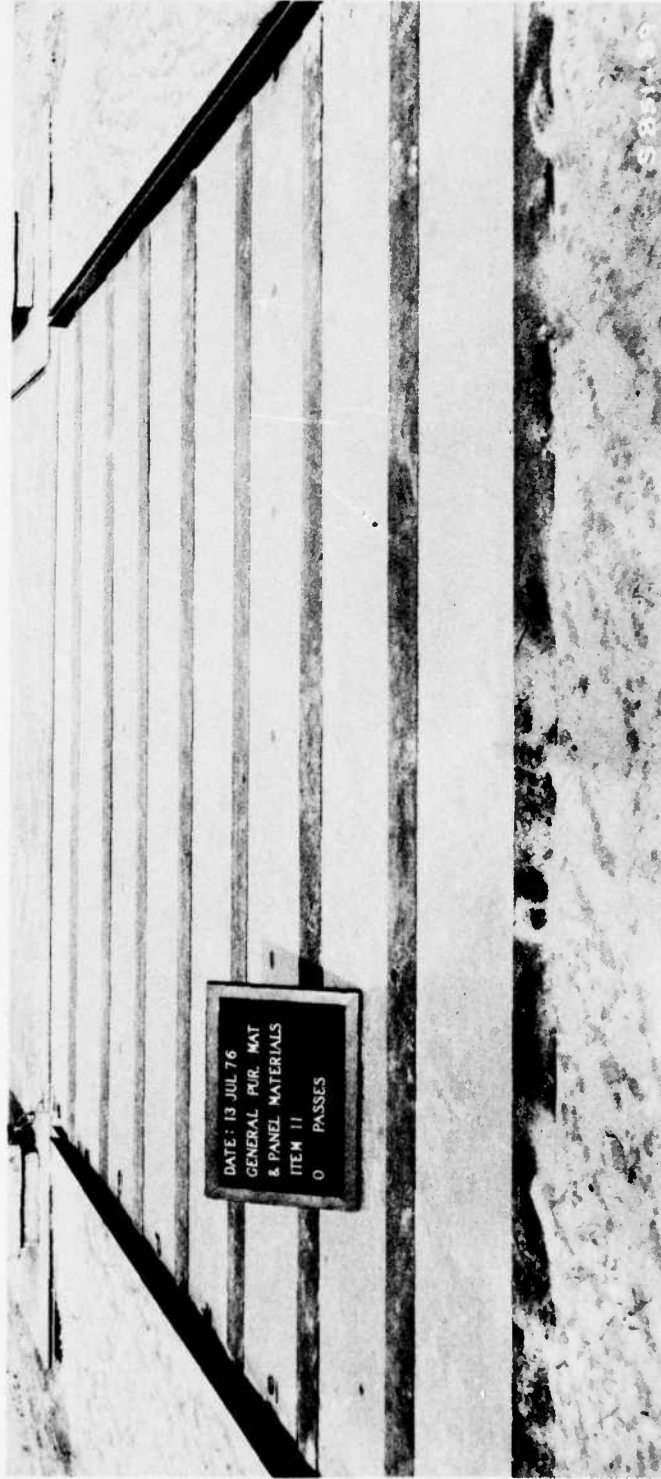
Item 11, test section 3; Spur-Ecolite sandwich panels connected with H connectors prior to traffic
